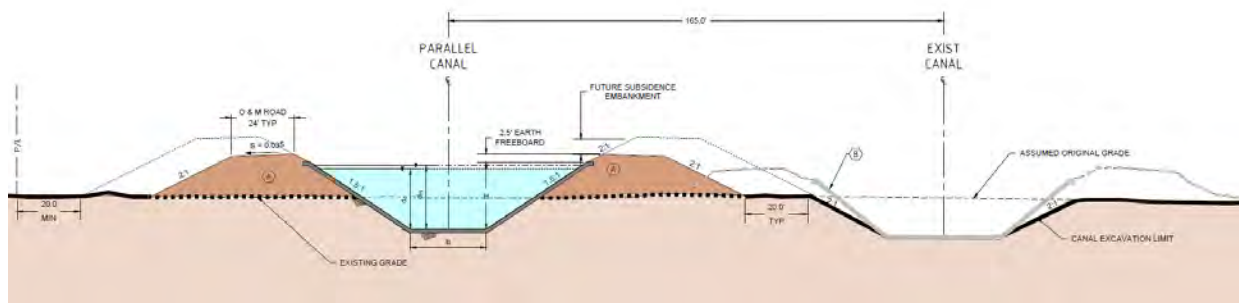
Trapezoidal Cross Section of Realigned Canal Segments in the Recommended Plan
